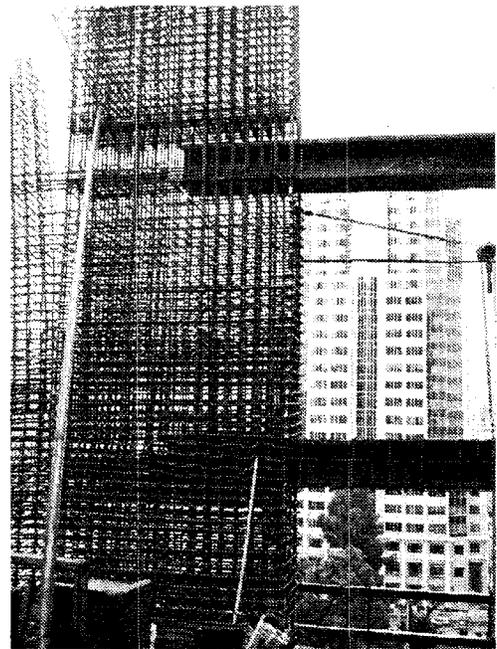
Photograph of Two Floors of As-Built Steel Link Beams
